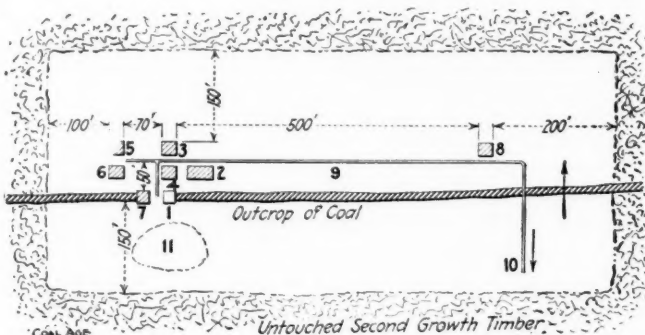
PLAN OF OPERATION AND BUILDINGS
